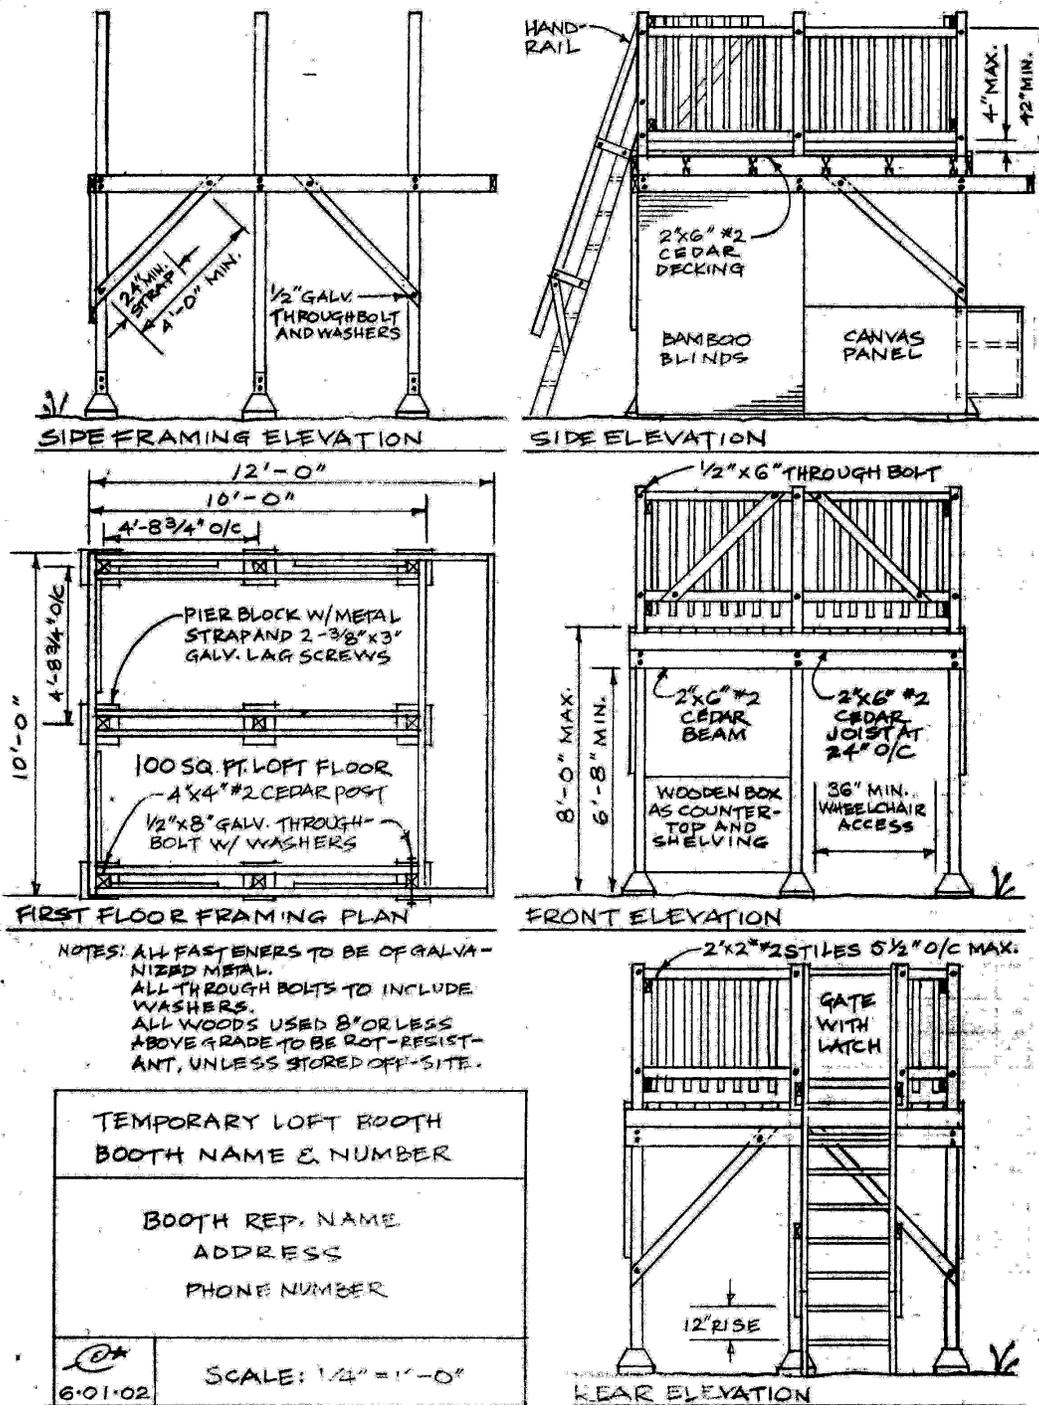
Sample Drawings - Framing plan and elevations for temporary removable loft booth
